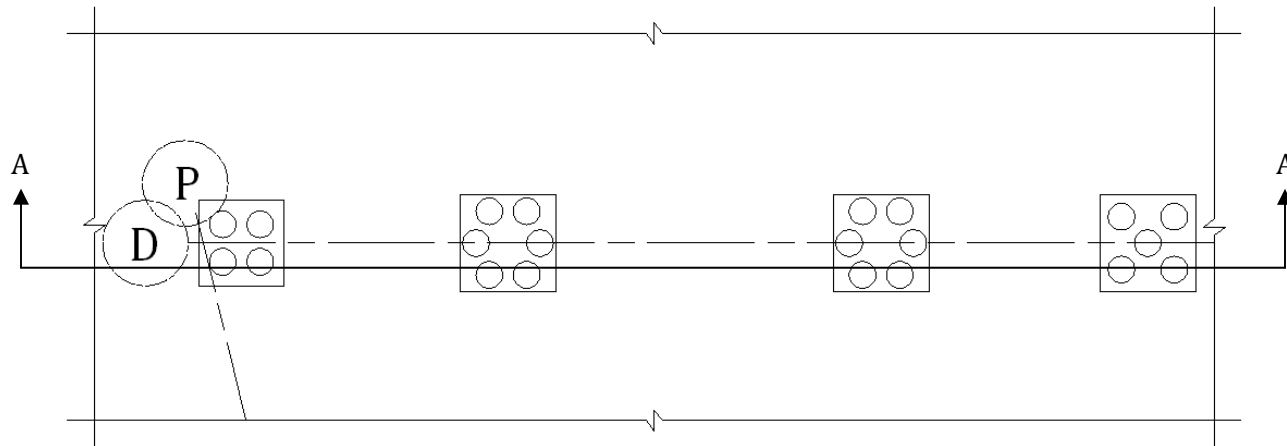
Enlarged Geopier Foundation Plan for SMF 3
